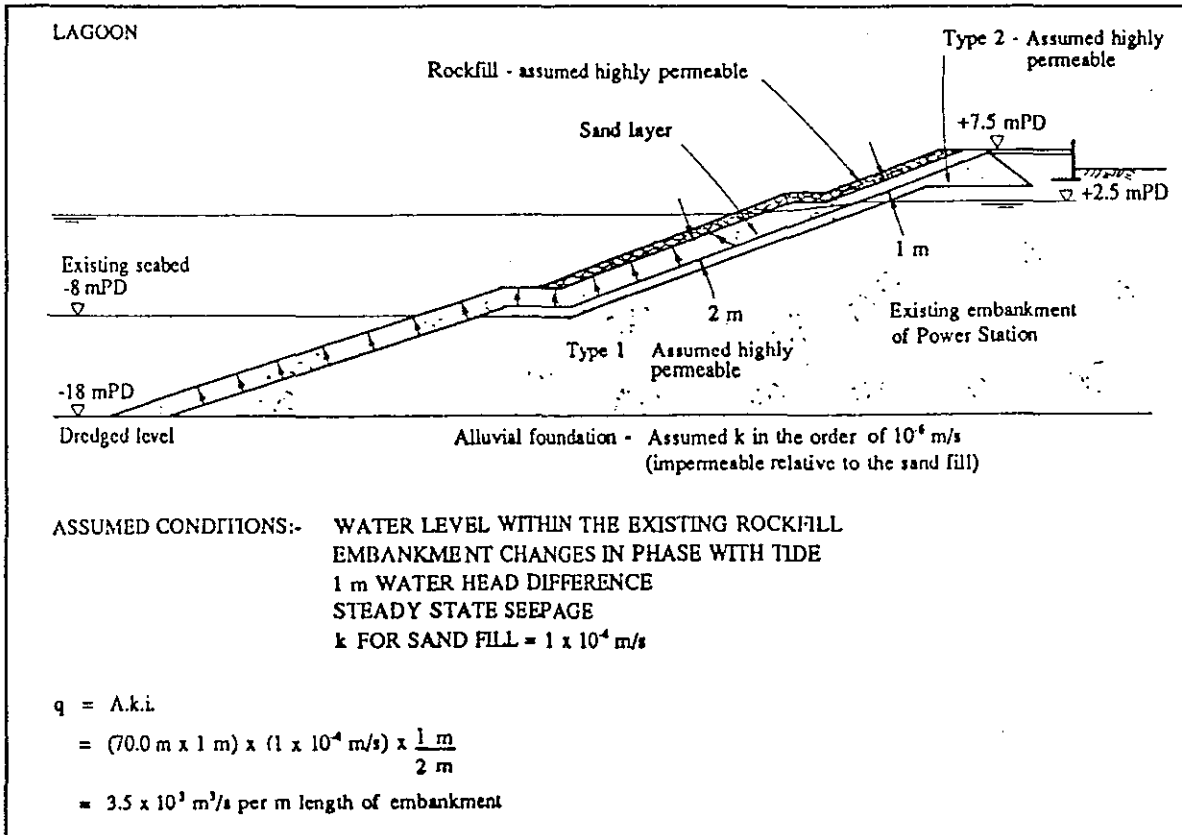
Seepage Through Power Station Section (Before Placing PFA)
